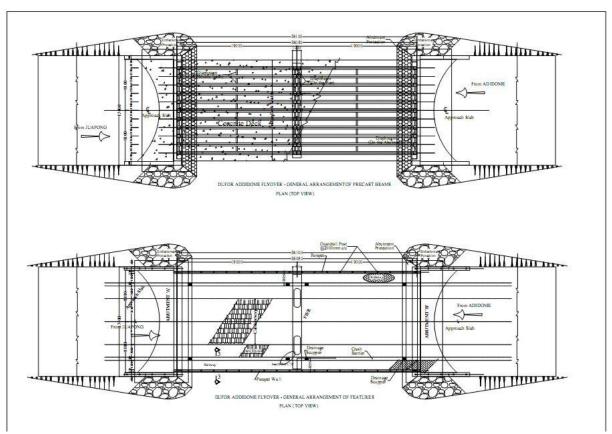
Bridge on Dufor Adidome Interchange CH.29+350 on Section 3 Project Road
